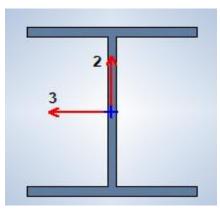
34: Built-up Structural Steel Section (ETABS 2016)
